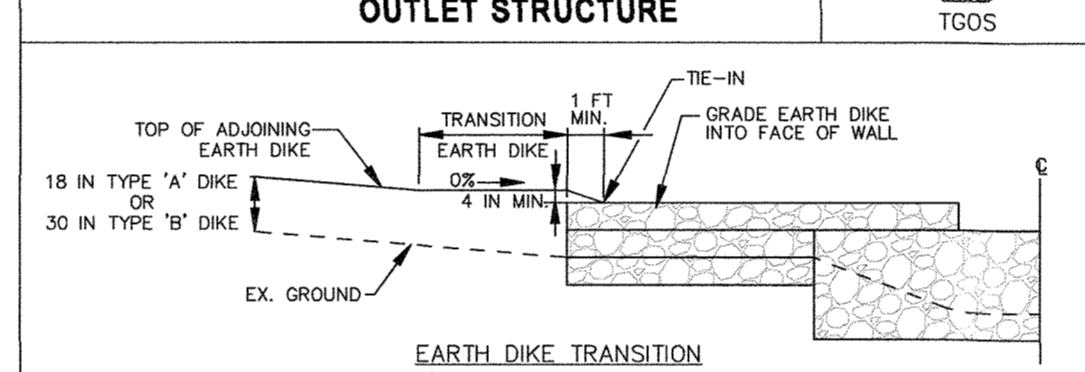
TEMPORARY GABION OUTLET STRUCTURE
